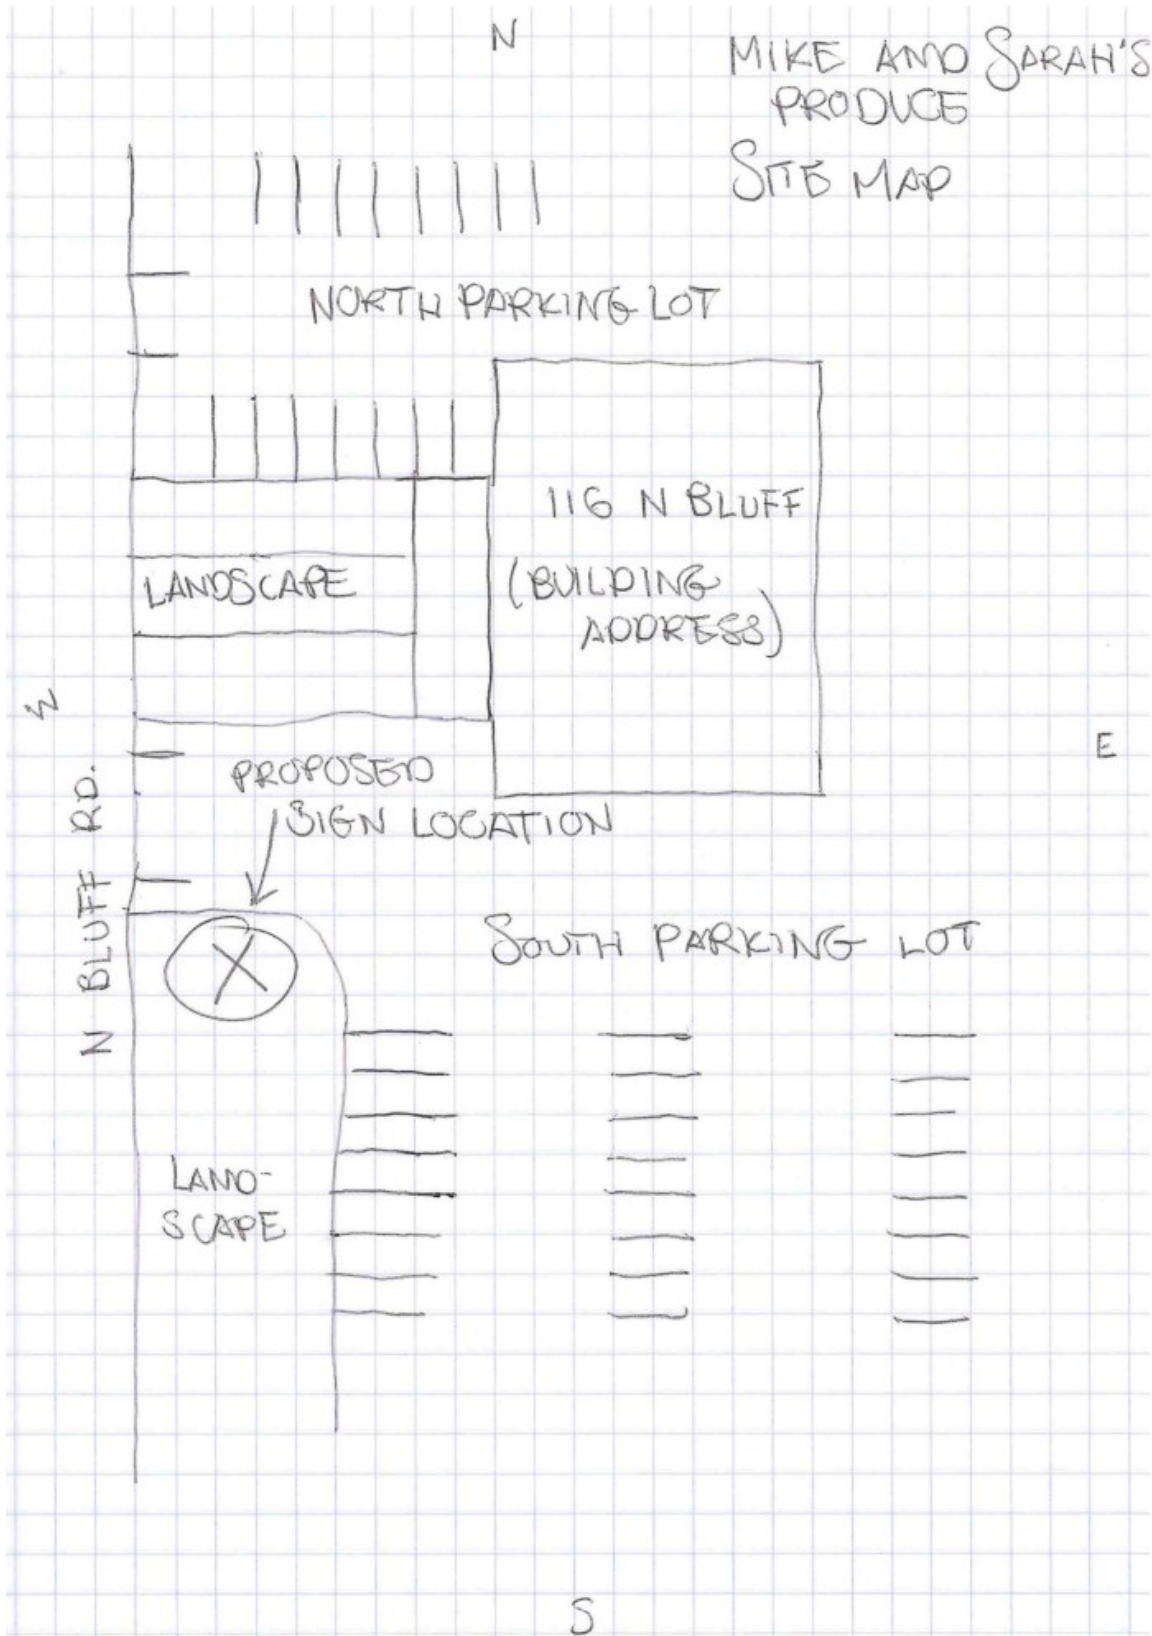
EXHIBIT A: PROPOSED SIGNAGE DETAILS
